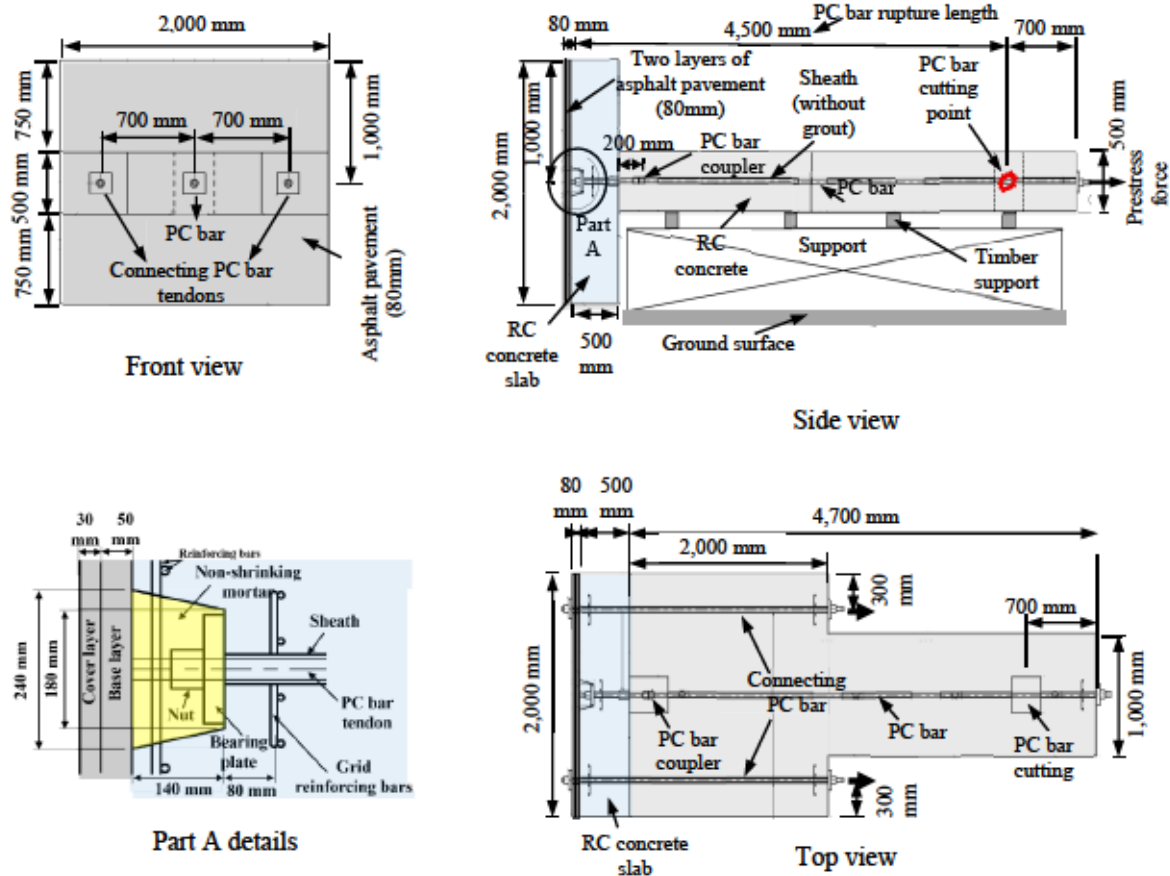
Specimen details with 80mm thick asphalt pavement [1]
